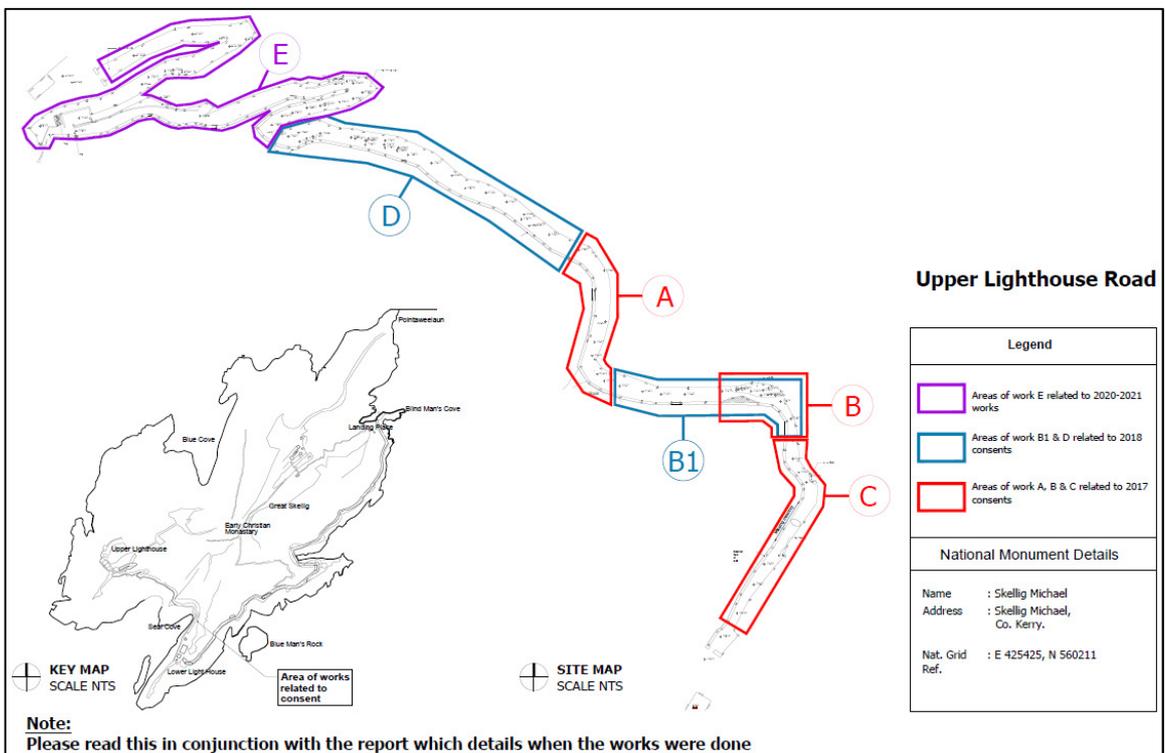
Works to Upper Lighthouse Road 2017 - 2021
